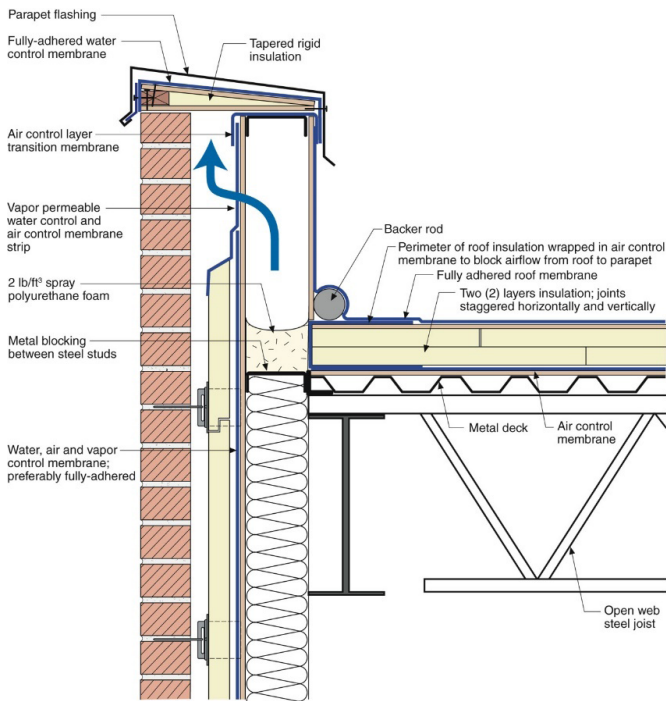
The Balloon Framed Steel Stud Parapet: This is the ugliest parapet to get right. Notice the use of spray polyurethane foam, the high density stuff, to provide air control layer continuity across the balloon framed exterior steel stud wall. The spray foam is supported by horizontal bridging or metal blocking. This is a tricky thing to execute and as such we design into the upper parapet assembly a pathway for drying via vapor diffusion to provide some performance redundancy.
